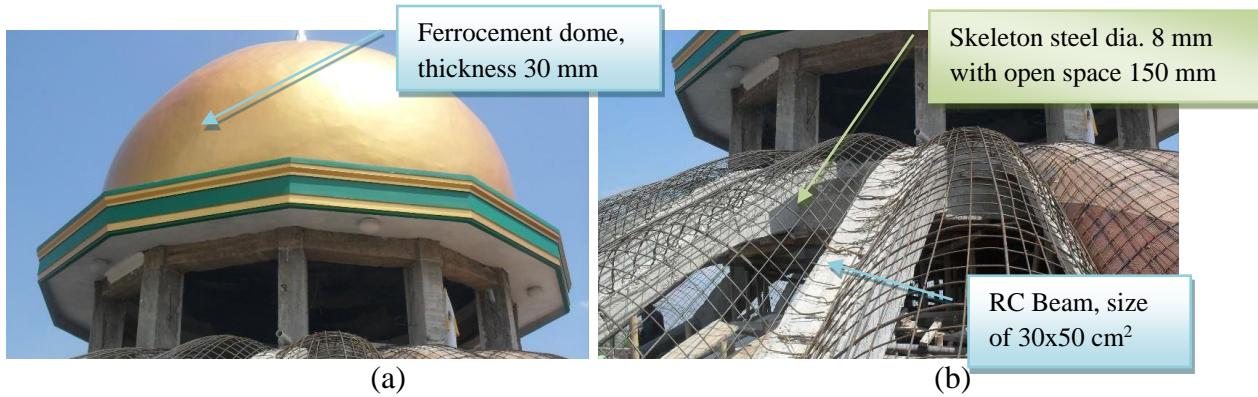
(a) Ferrocement Dome; (b) Reinforcement of Ferrocement wave roofs.
